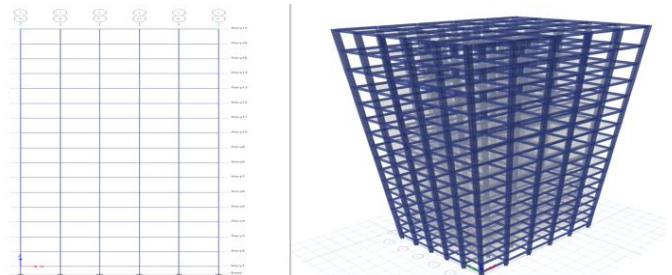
(G+15) storied building as bare frame with open ground storey.
